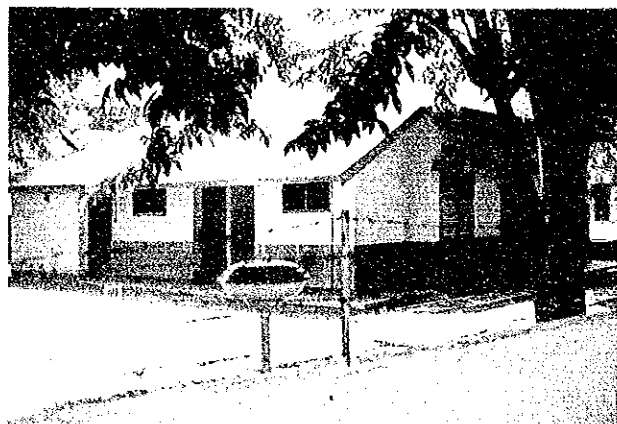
Example of Slight Damage of Masonry House
